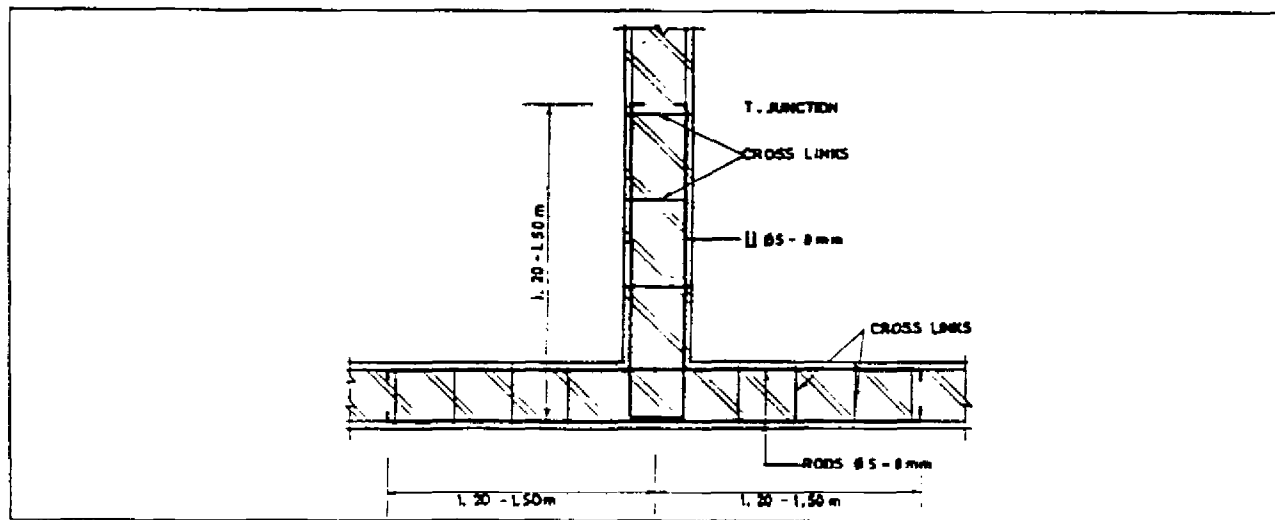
Horizontal Reinforcement at T-Junction [1]
